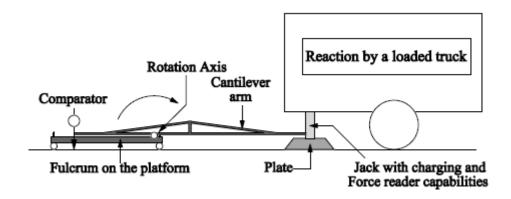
Installation of Plate Load Test (Source: Monnet, 2015)
